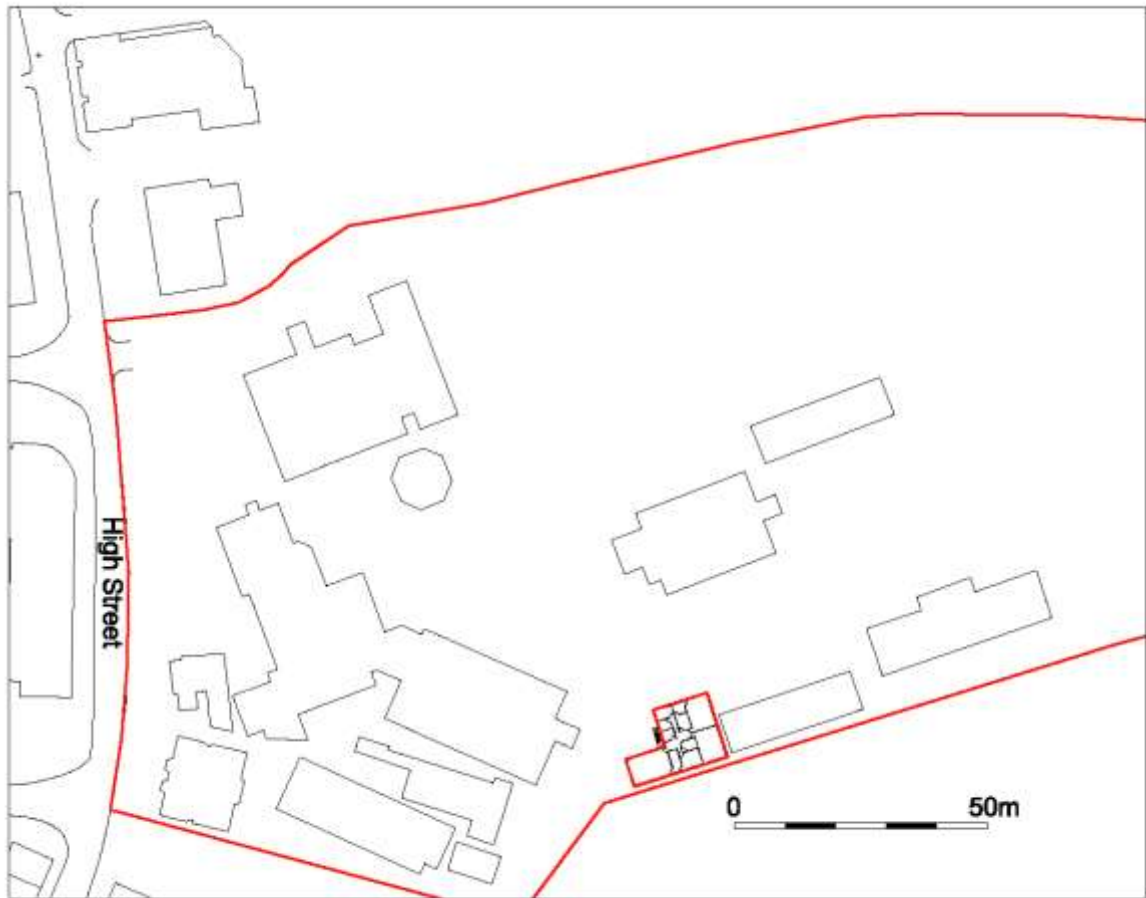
Site plan showing location of new music block (*scale 1:1500*)
